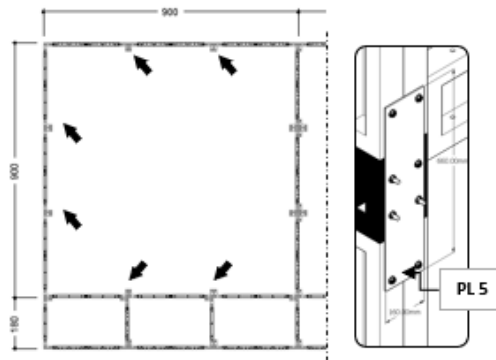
Steel plates at the joints of the perimeter column at an elevation of 3 meters of the structure.
